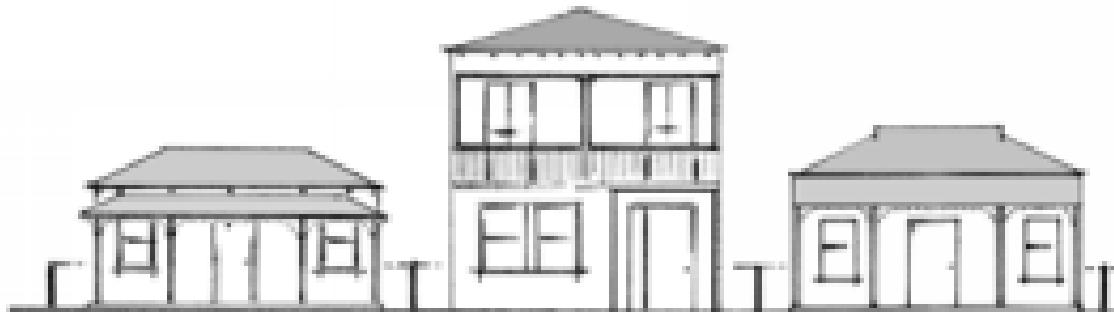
Inappropriate infill not orientated to address the street and inconsistent with the existing streetscape.
